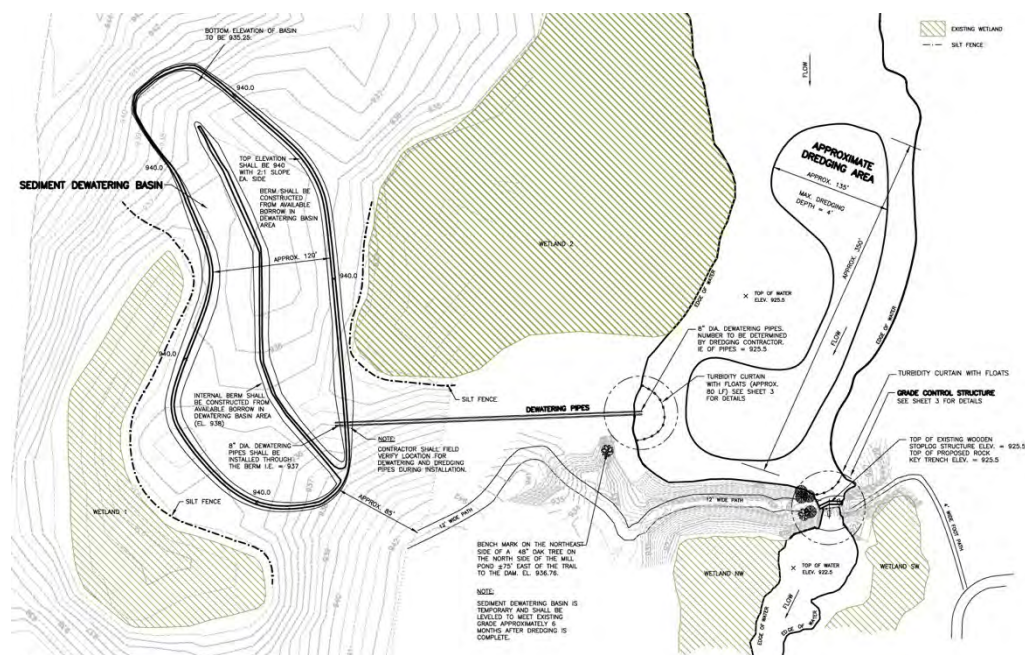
Site Plan for Petit Mill Pond sediment control project.
